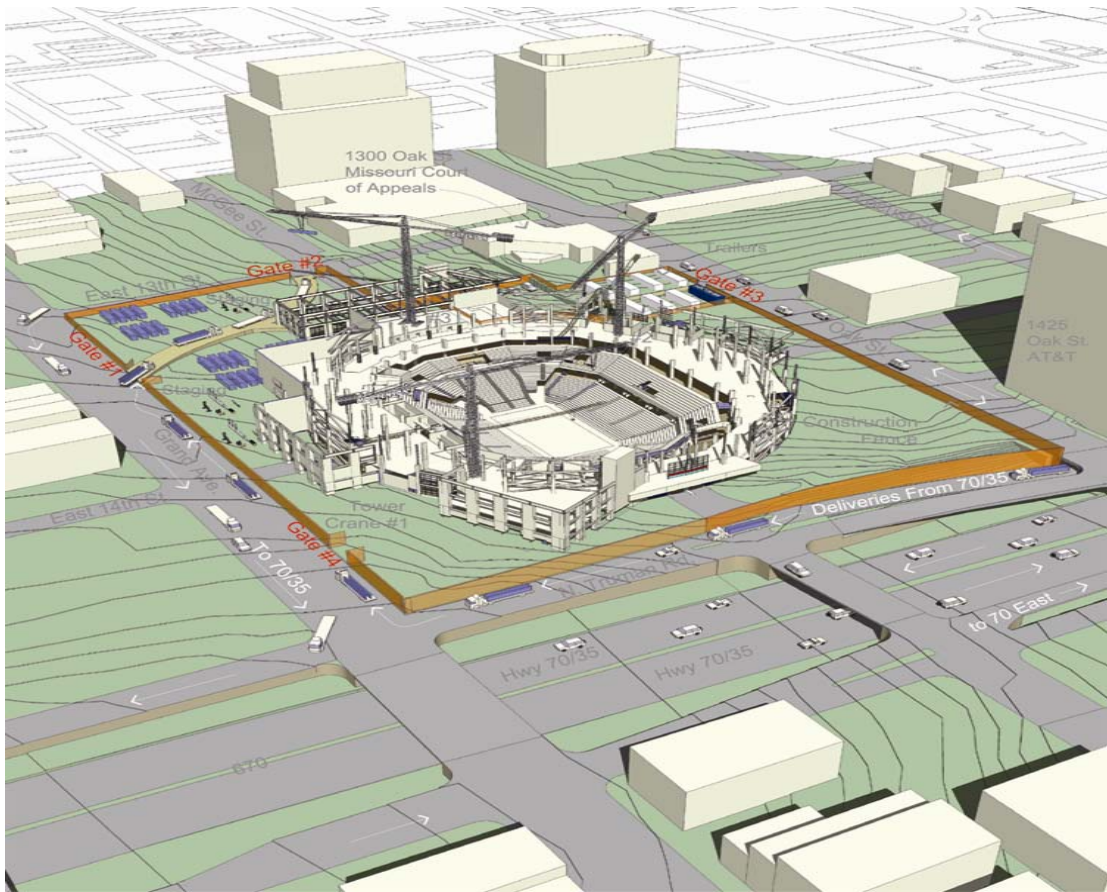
4D Site Logistics Plan for Sprint Center Arena (*Mortenson 4D Image*)
